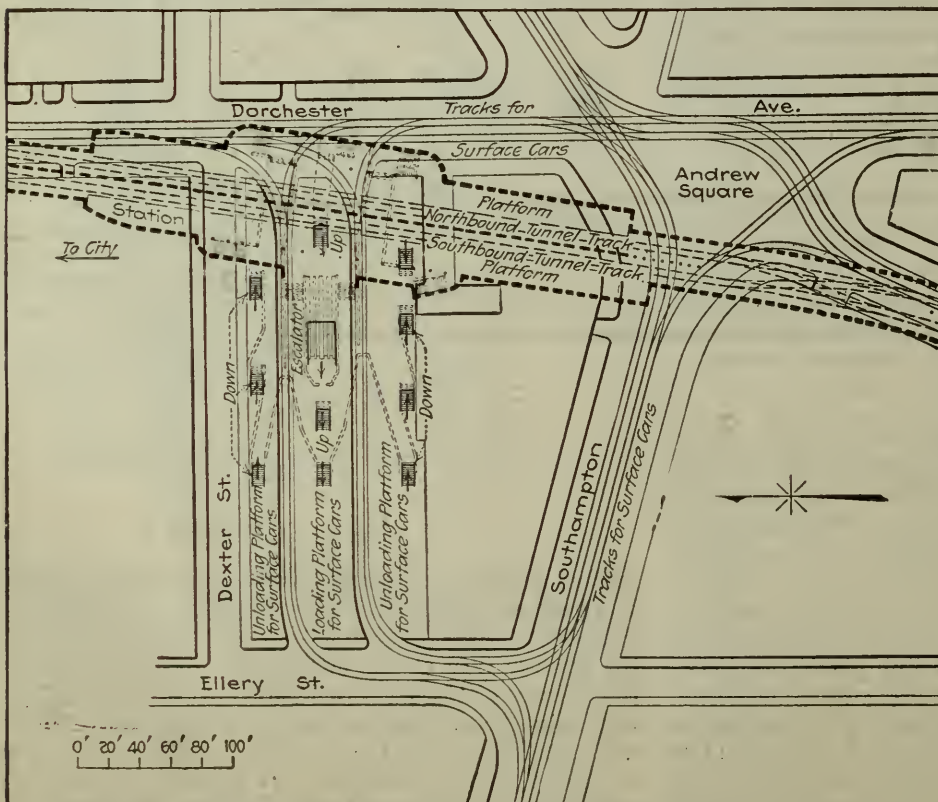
ANDREW SQUARE STATION, DORCHESTER TUNNEL, BOSTON
